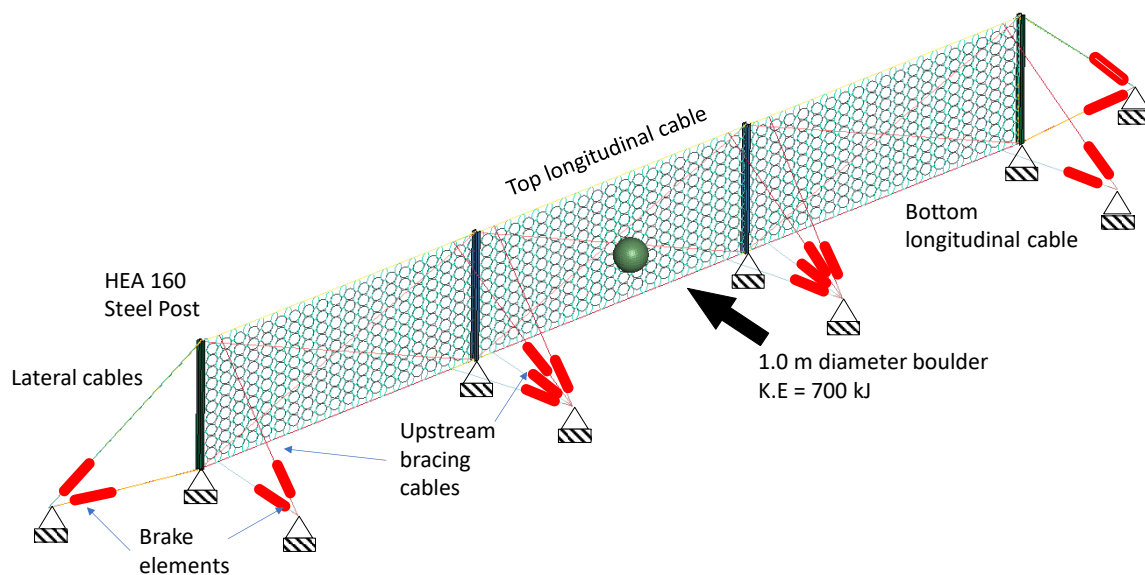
Numerical Model Setup of Steel Flexible Barrier System Oblique 3D with Boulder
